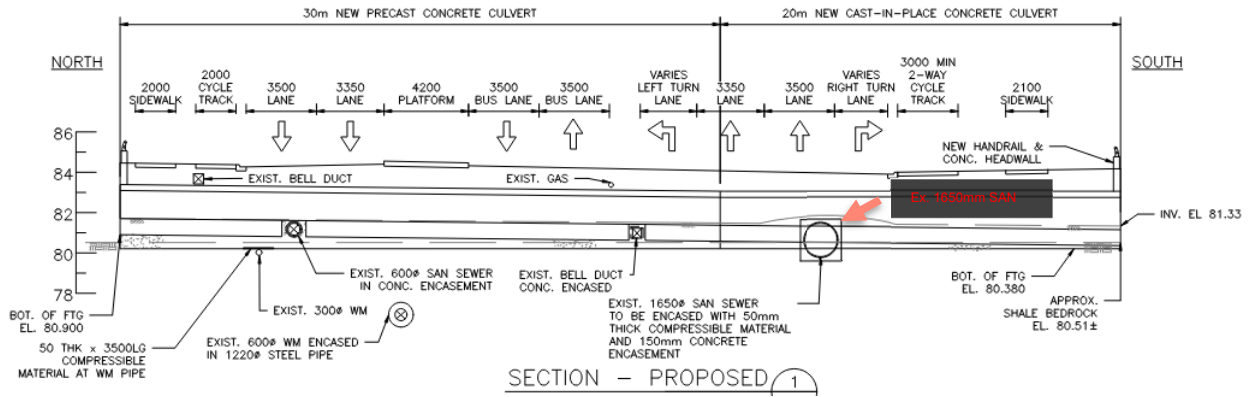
Proposed Serson Creek Profile (General Arrangement)
